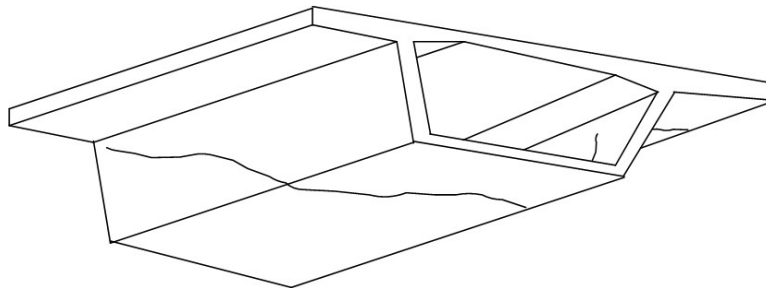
Box Girder Cracks Induced by Torsion and Shear
